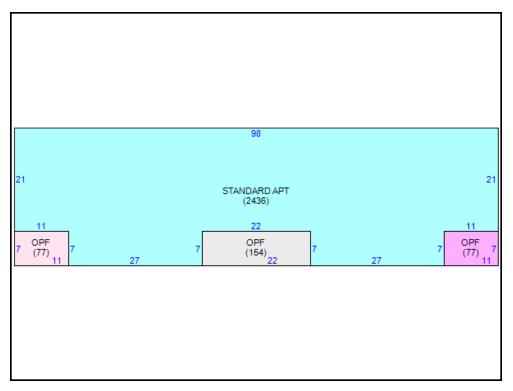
Standard triplex apartment plan (Leon County Property Appraiser 2020).
